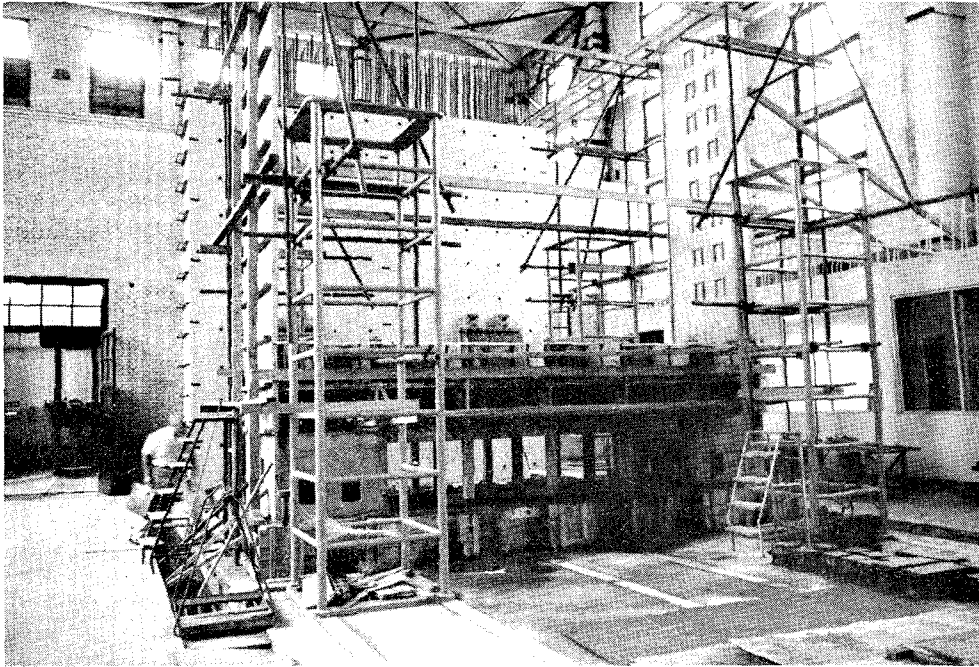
Scale model of twelve-story reinforced concrete building under construction at the Academy of Building Research, Beijing.
